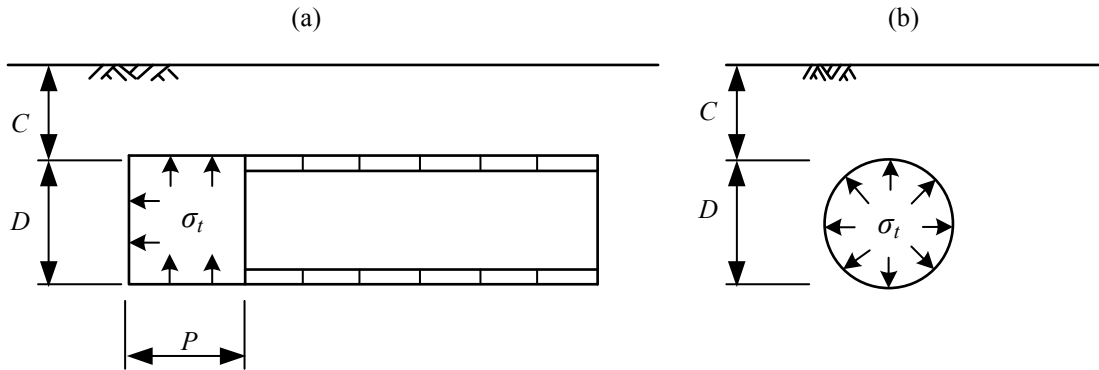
(a) Tunnel heading; (b) 2D idealisation of tunnel heading in the transverse plane [Mair and Taylor (1999)].
